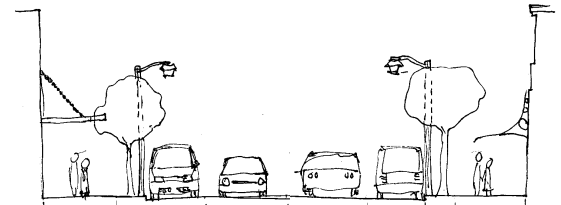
Illustrative Cross-Sections for Streets in Centers
